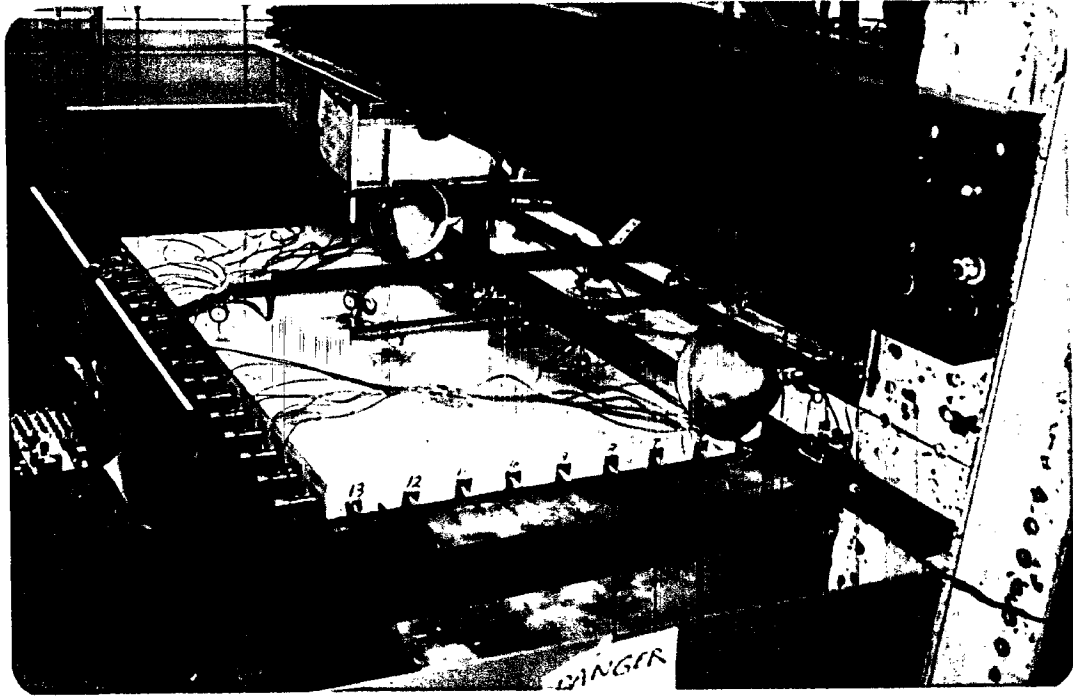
LOADING SYSTEM FOR PRESTRESSED SLAB B.1.
